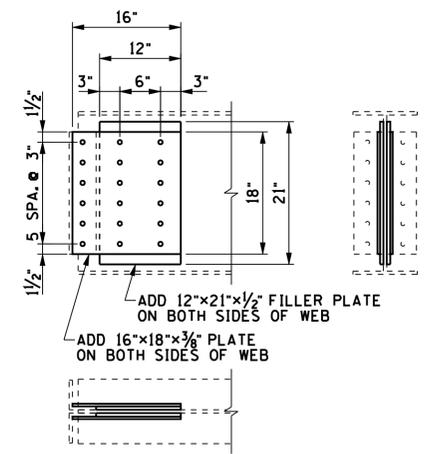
DETAIL "Y" - FLOOR BEAM FLANGE REPAIR
